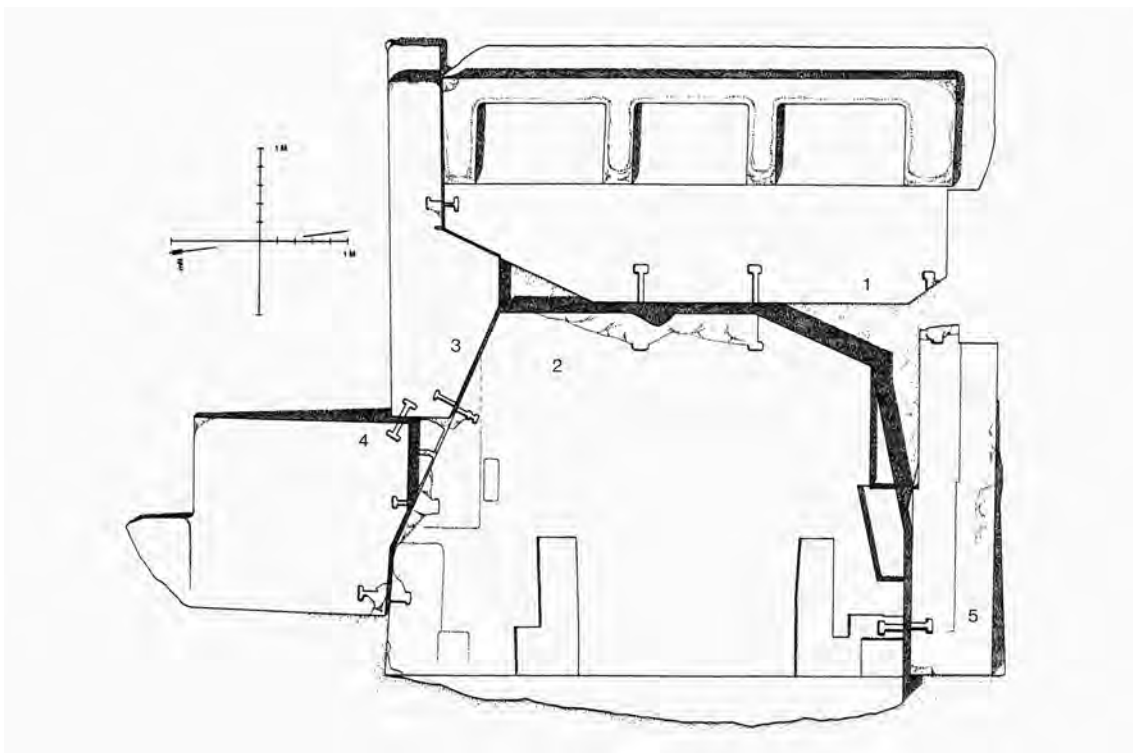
Plan of Platform I (drawing by Jean-Pierre Protzen).
